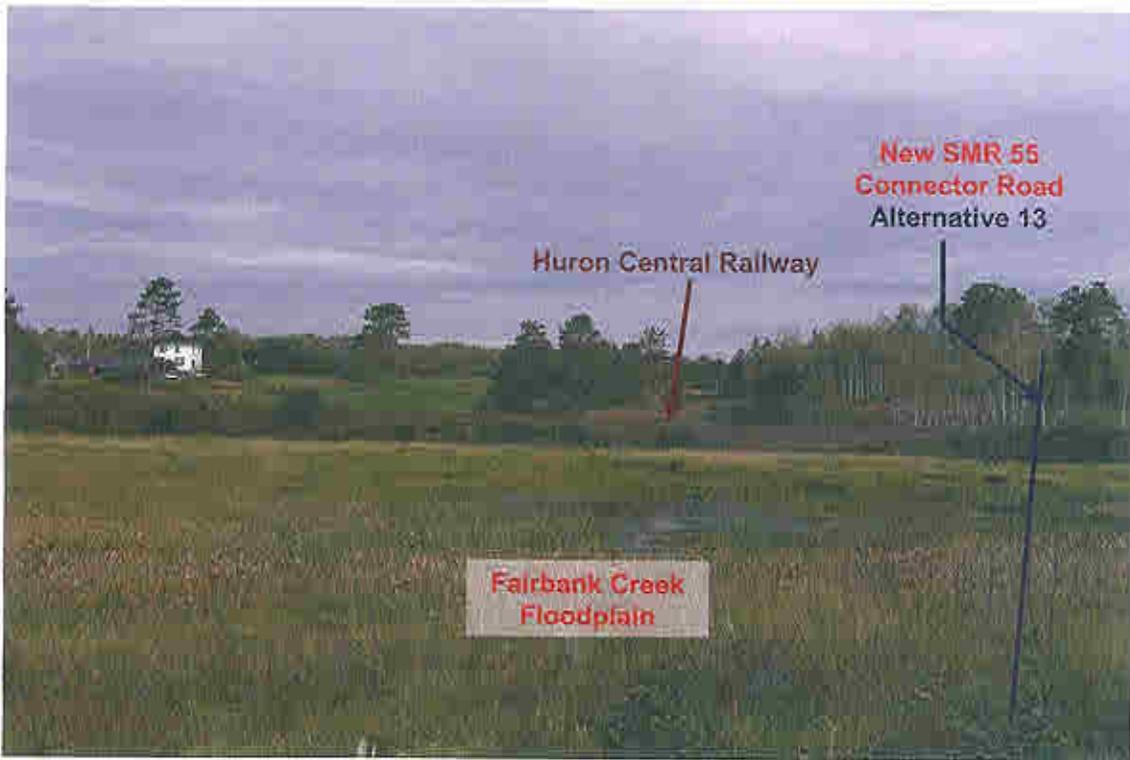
VIEW: Looking northwest from south shoulder of Lockerby Mine Road about 300 m east of SMR 3. (September 12, 2006)
